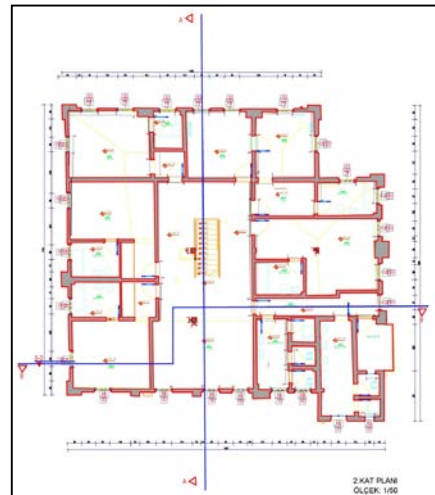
(a). 1st floor plan (ERÜ general directorate of construction, 2017)
